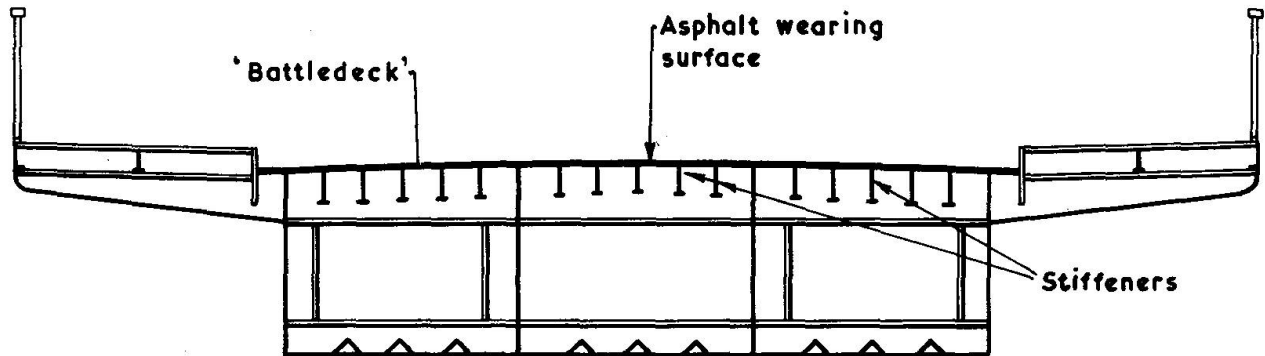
CROSS SECTION OF SWING BRIDGE AT REGENTS CANAL DOCK, LONDON.
